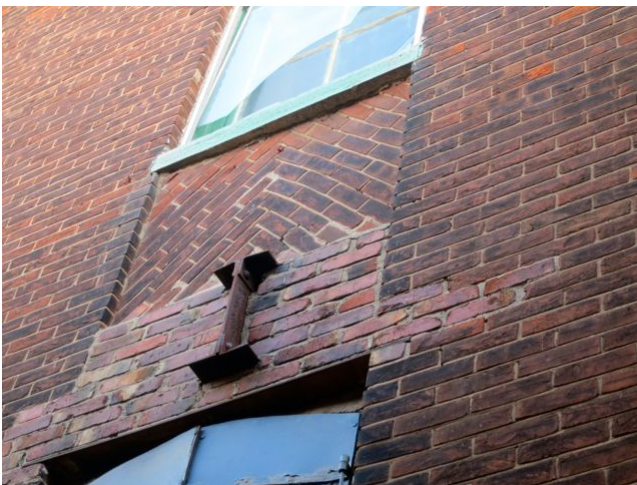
Modern steel I-beam set in the exterior masonry wall. These will not be removed.
